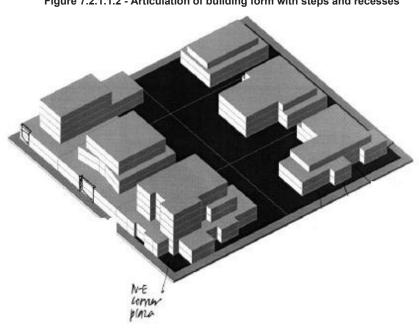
Articulation of building form with steps and recesses
